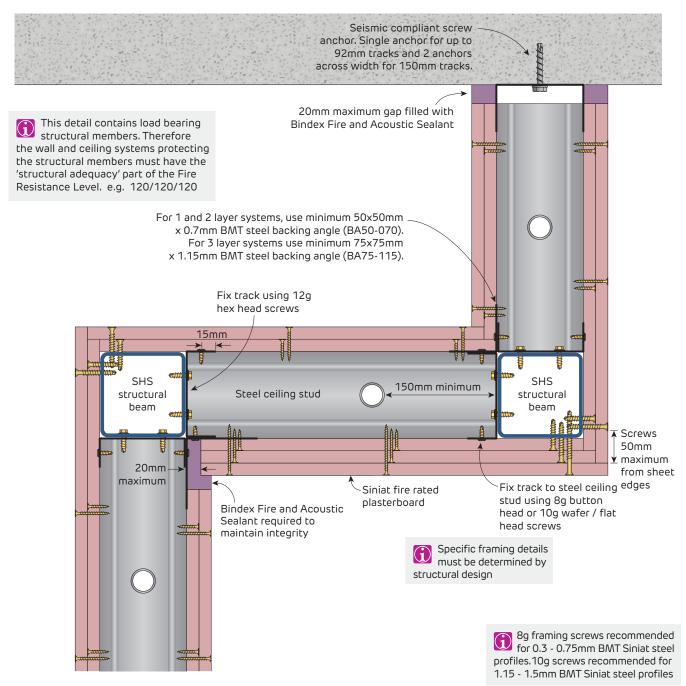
Stud Wall with Integrated Bulkhead Section
